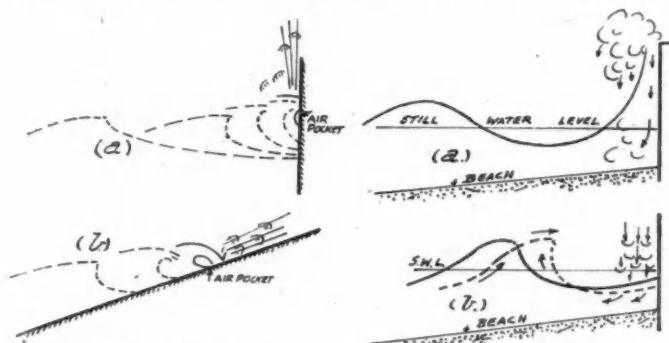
Breaking Waves on Vertical and Sloping Walls.
